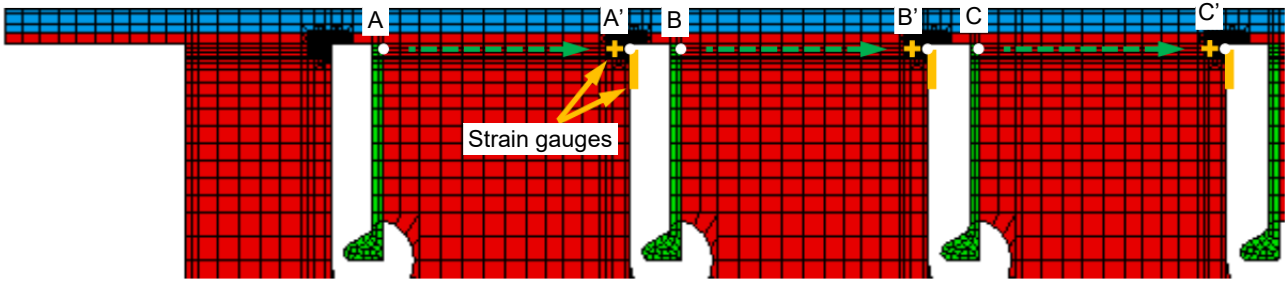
Finite element model of the steel bridge deck with overlaid UHPFRC (Unit: mm)
